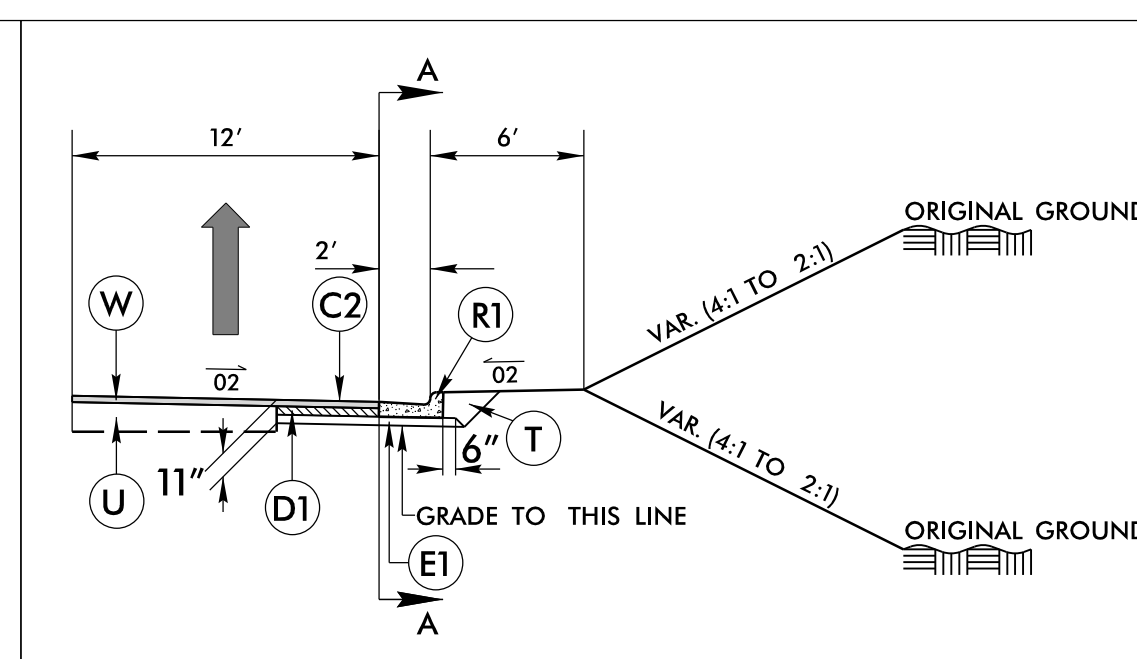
DETAIL SHOWING MILLED PAVEMENT PROFILE TIE-IN
